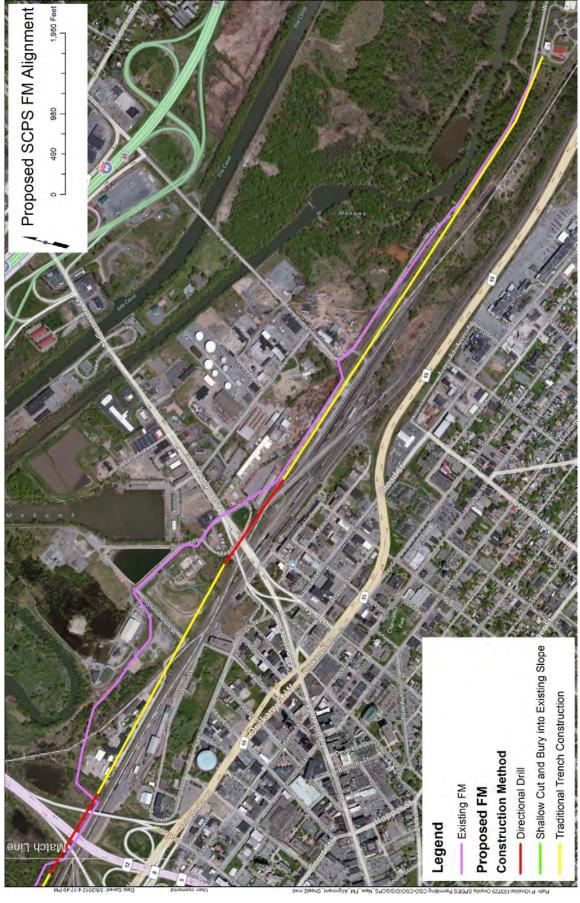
(Continued) SCPS FM ALIGNMENT Another construction challenge is installation along and through a large wetland area. In this area, the existing FM easement runs parallel to the railroad easement and embankment. To minimize cost and impact to the wetland hydrology, we propose to install the new FM near or at the existing surface grade along the toe of the embankment, and fill to cover it to a depth of a few feet. Depending on soil conditions, pipe support piles may be needed. Several H-20 rated vehicular crossings will be added to improve access to the easement for maintenance and inspection activities. See Figure 8-5 for a typical section of the proposed FM. In the remaining areas of the alignment, traditional open-trench cut and fill construction will be used.
